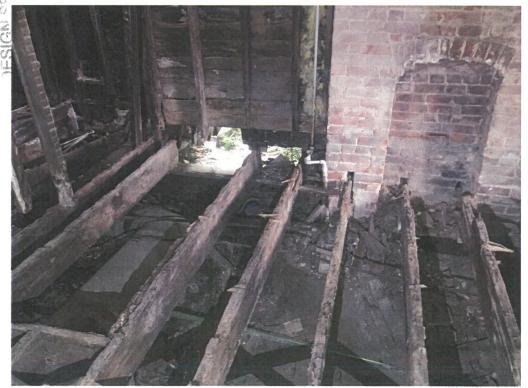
More severe deterioration of the 1^{st} Floor joists and wall framing along the right wall in the front of the home
